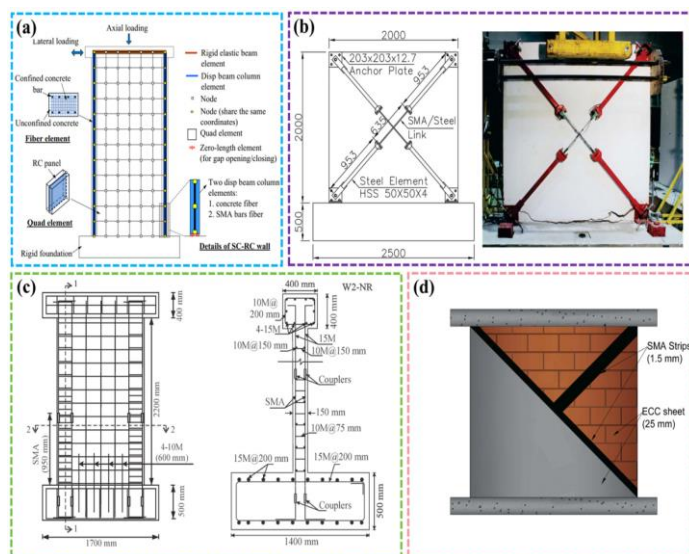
Shear walls strengthened with SMA: (a) Finite element simulation of the SMA-reinforced shear wall's plastic zone [84]; (b) SMA shear wall with external reinforcement [89-91]; (c) Design of shear walls reinforced with SMA [92]; (d) SMA-ECC shear wall [98].
